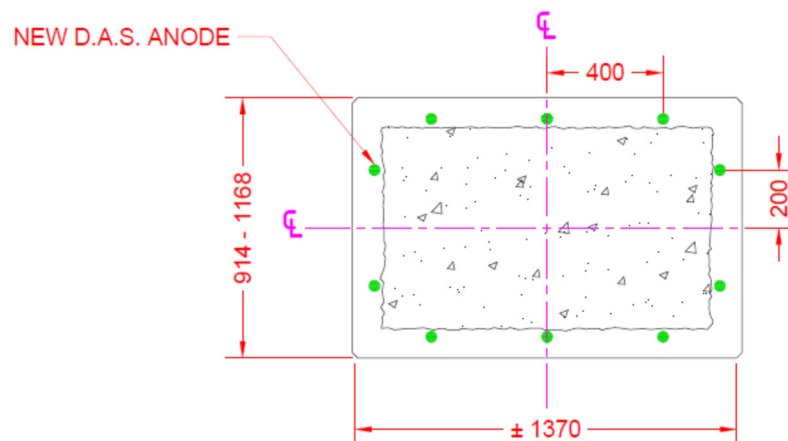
Distributed Galvanic Anode Layout around a Typical Pier Column
